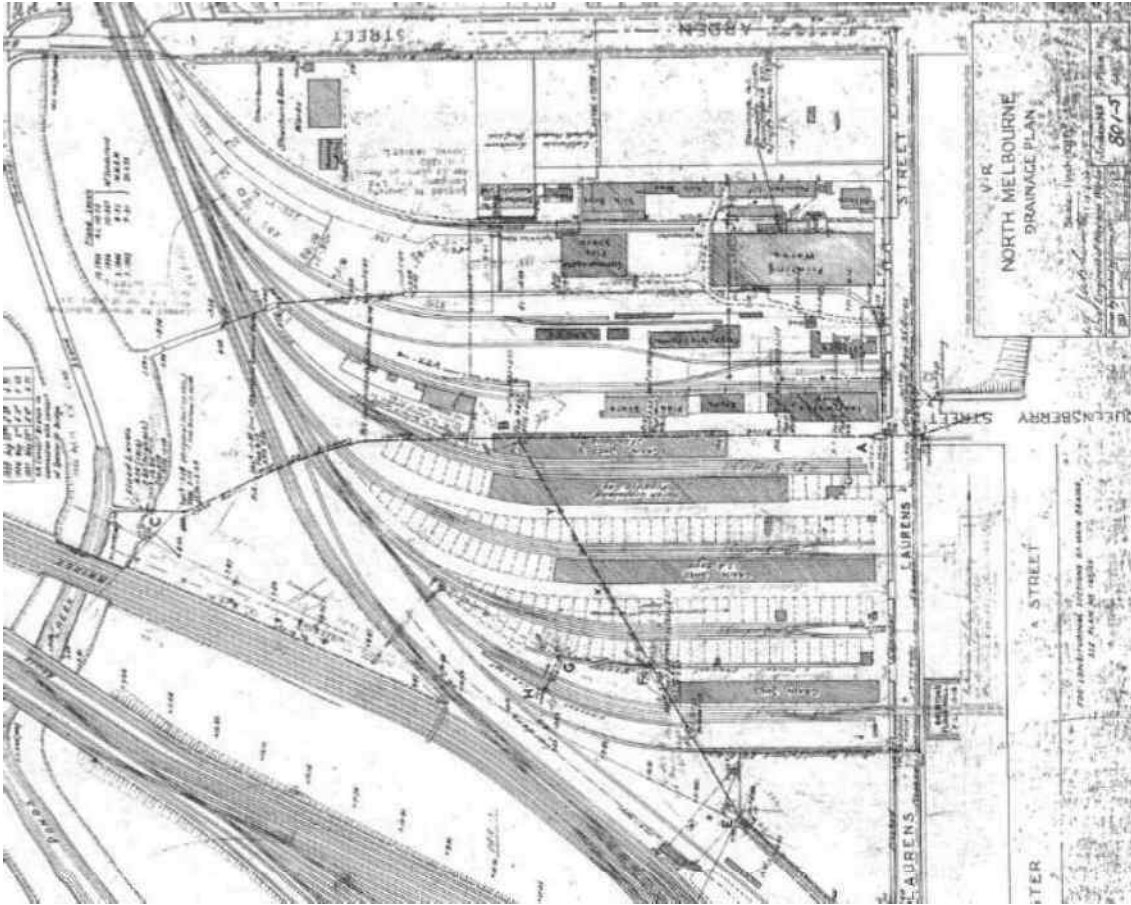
1928 plan of the Arden station site, showing the development of the railway reserve for Railways Department workshops, and additional grain sheds/stores south of Queensberry Street
